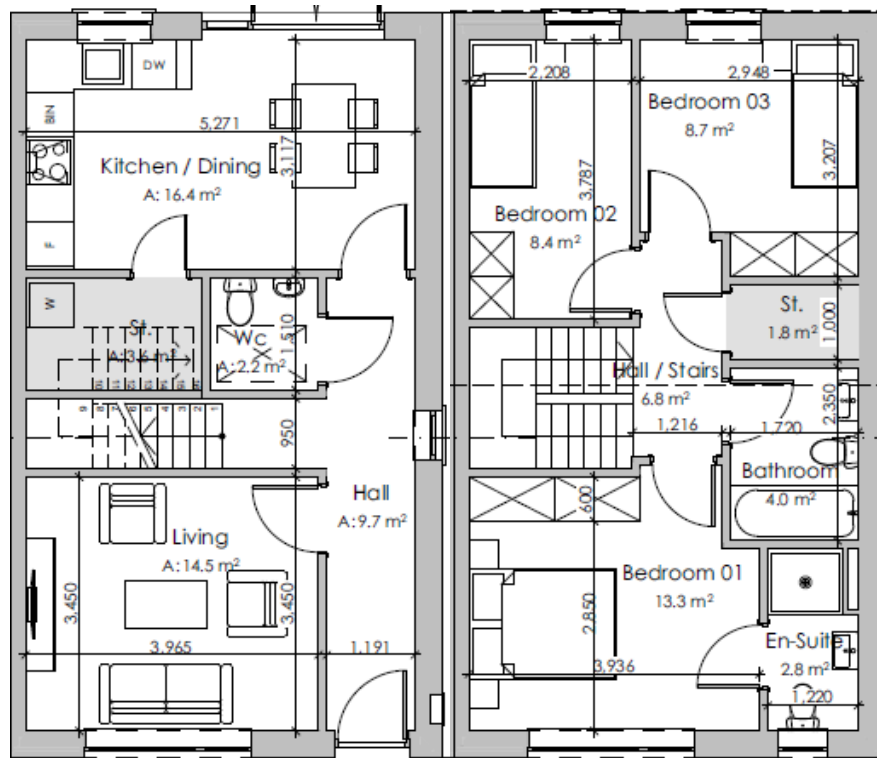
Ground (l) and first (r) floor plans of House Type 3.6.
